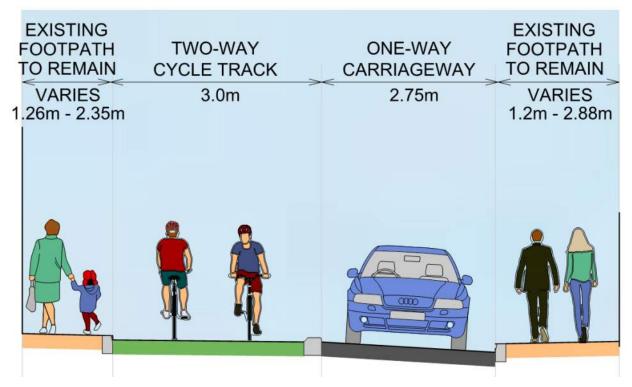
Typical Section 2 Option B Cross Section South Circular Rd - Two Way Cycle Track (at pinch point)
